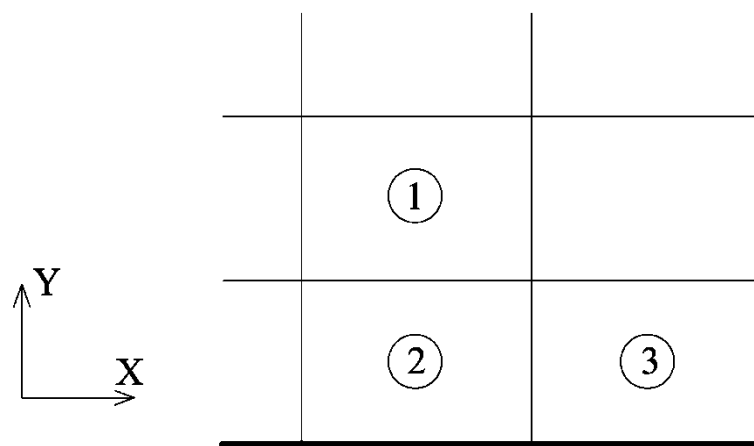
Typical building corner floor layout with rectangular slab panels
